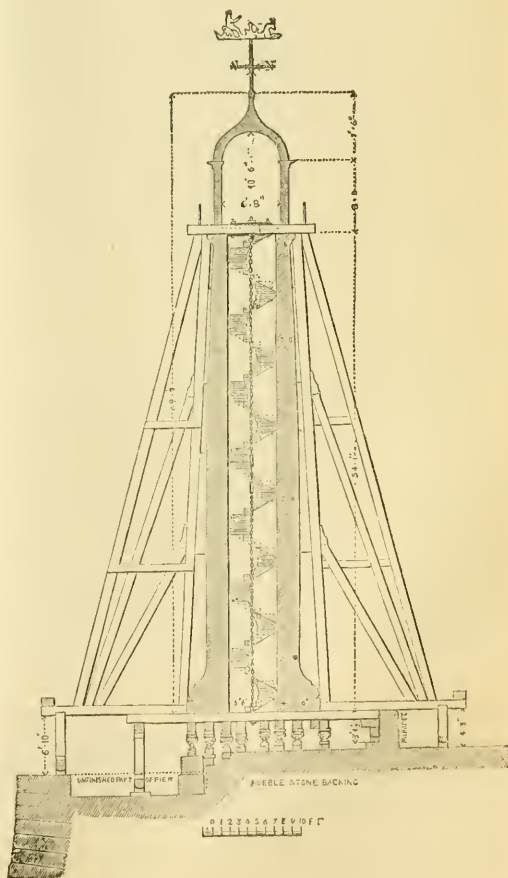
Section of the Light-house, showing the Rail-balks, &c.
